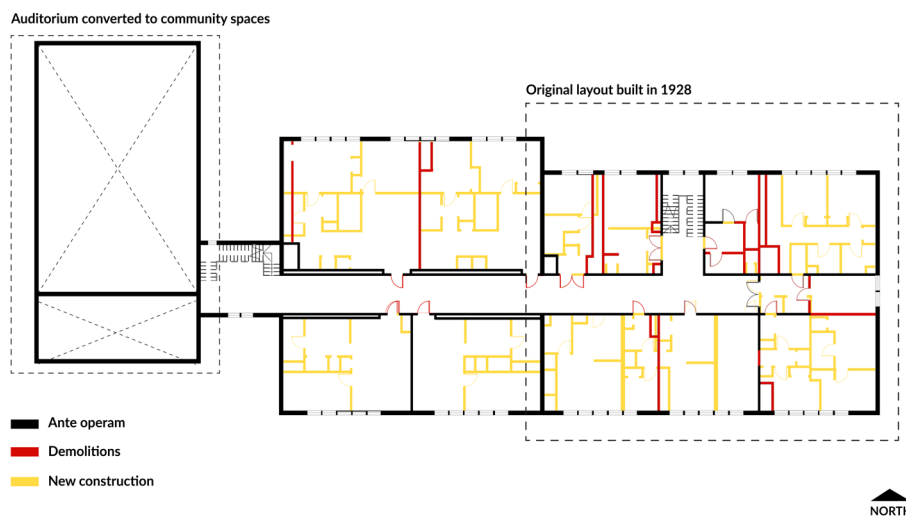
Second floor plan of demolitions and new construction of Marcus Garvey Harmony Apartments. Source: Authors.
